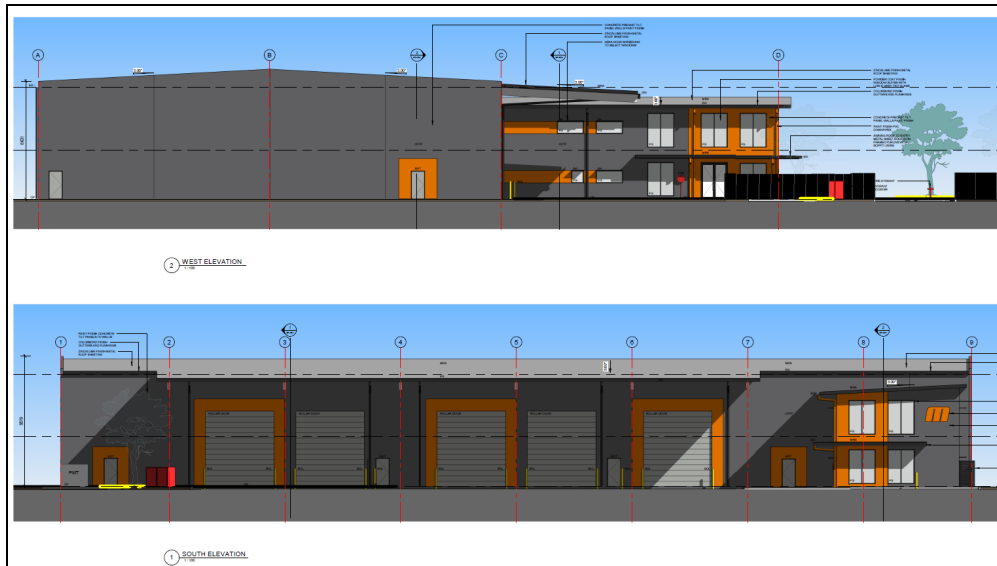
Elevations (West and South) (Source: Multi Span Australia Design Construct)
